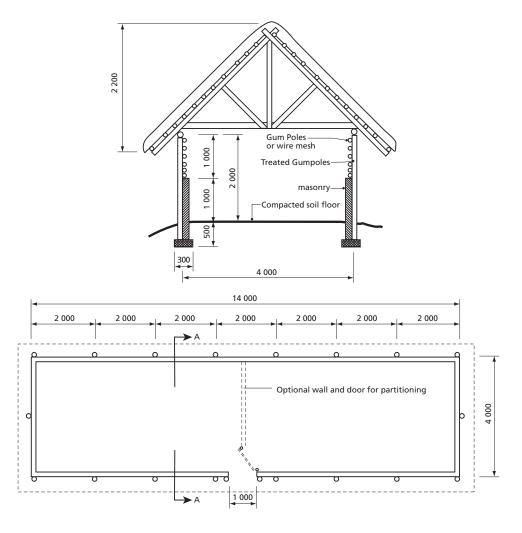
Sheep/goat house for 100 animals. In a warm climate gum-pole rails instead of the masonry walls provide better ventilation
